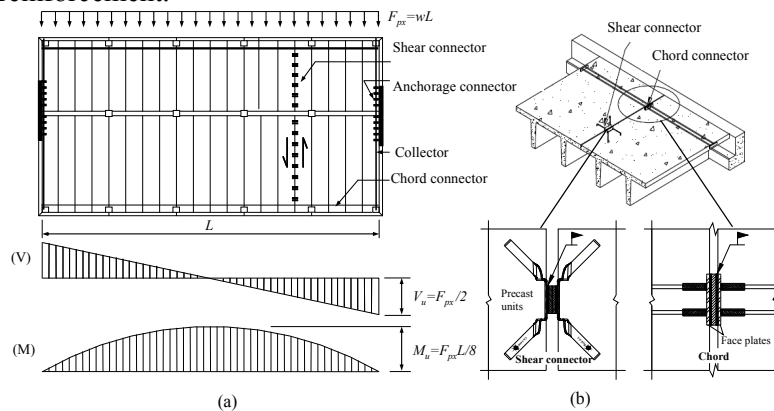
Precast diaphragm design: (a) Plan with internal forces (modified from Fleischman and Wan 2007); (b) Typical reinforcement details.
